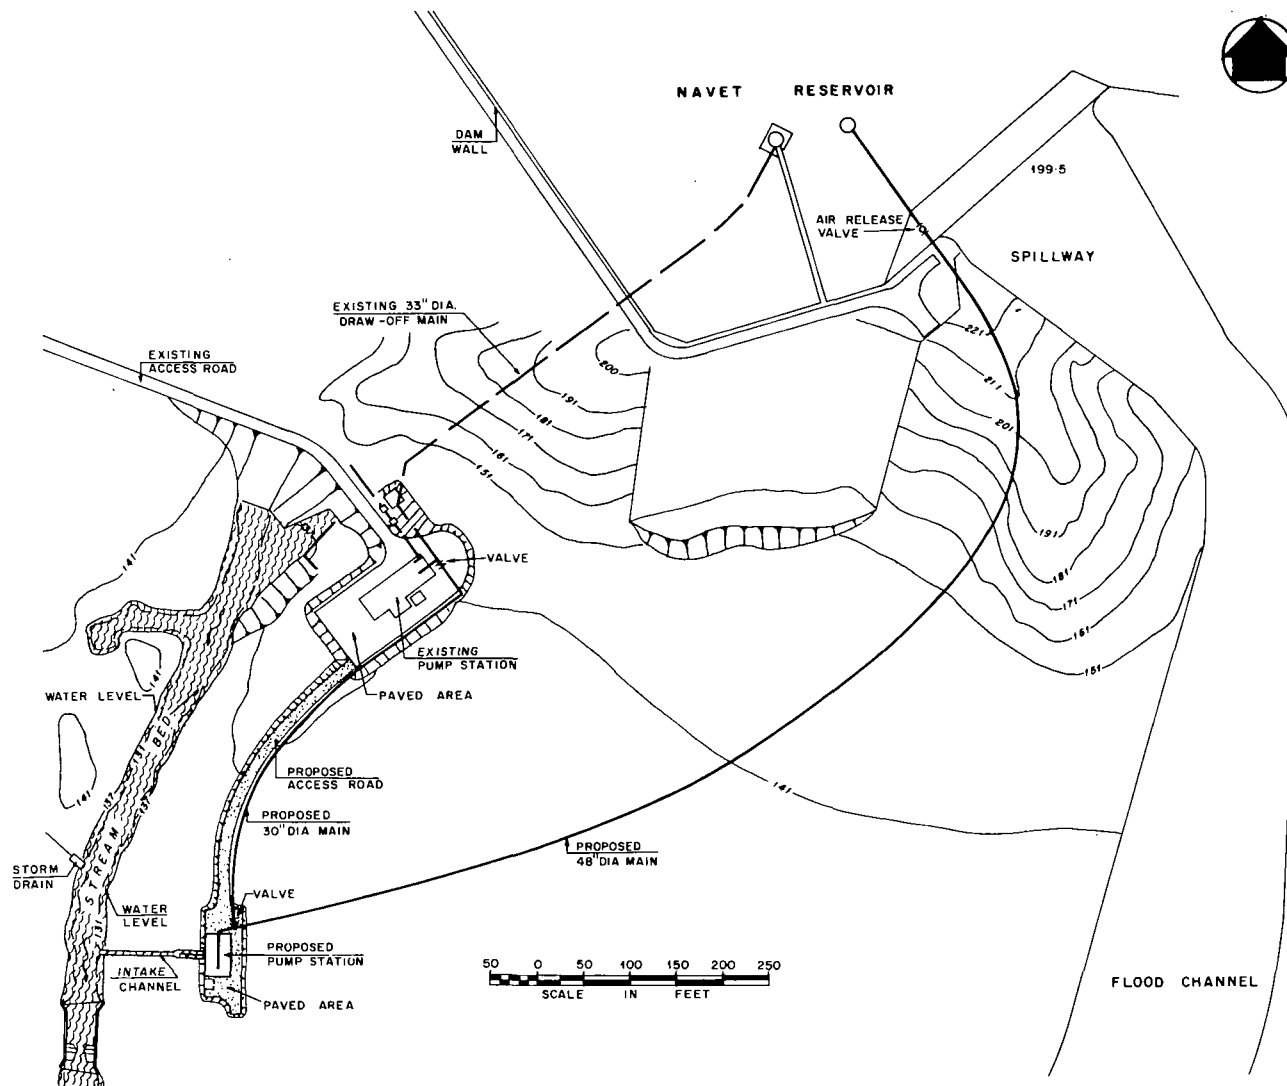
NAVET INTAKE AND PUMP STATION – SITE PLAN
